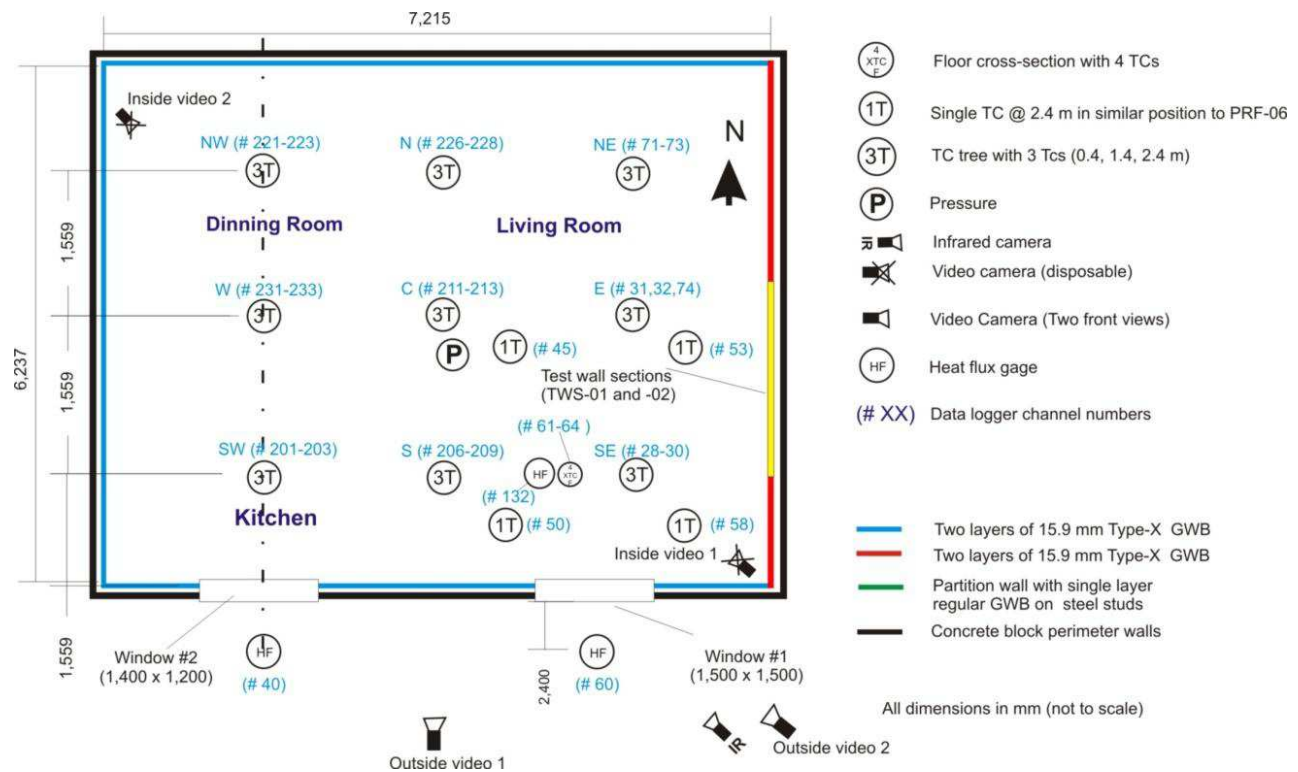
Layout of instrumentation in Tests PRF-10 and -14.
